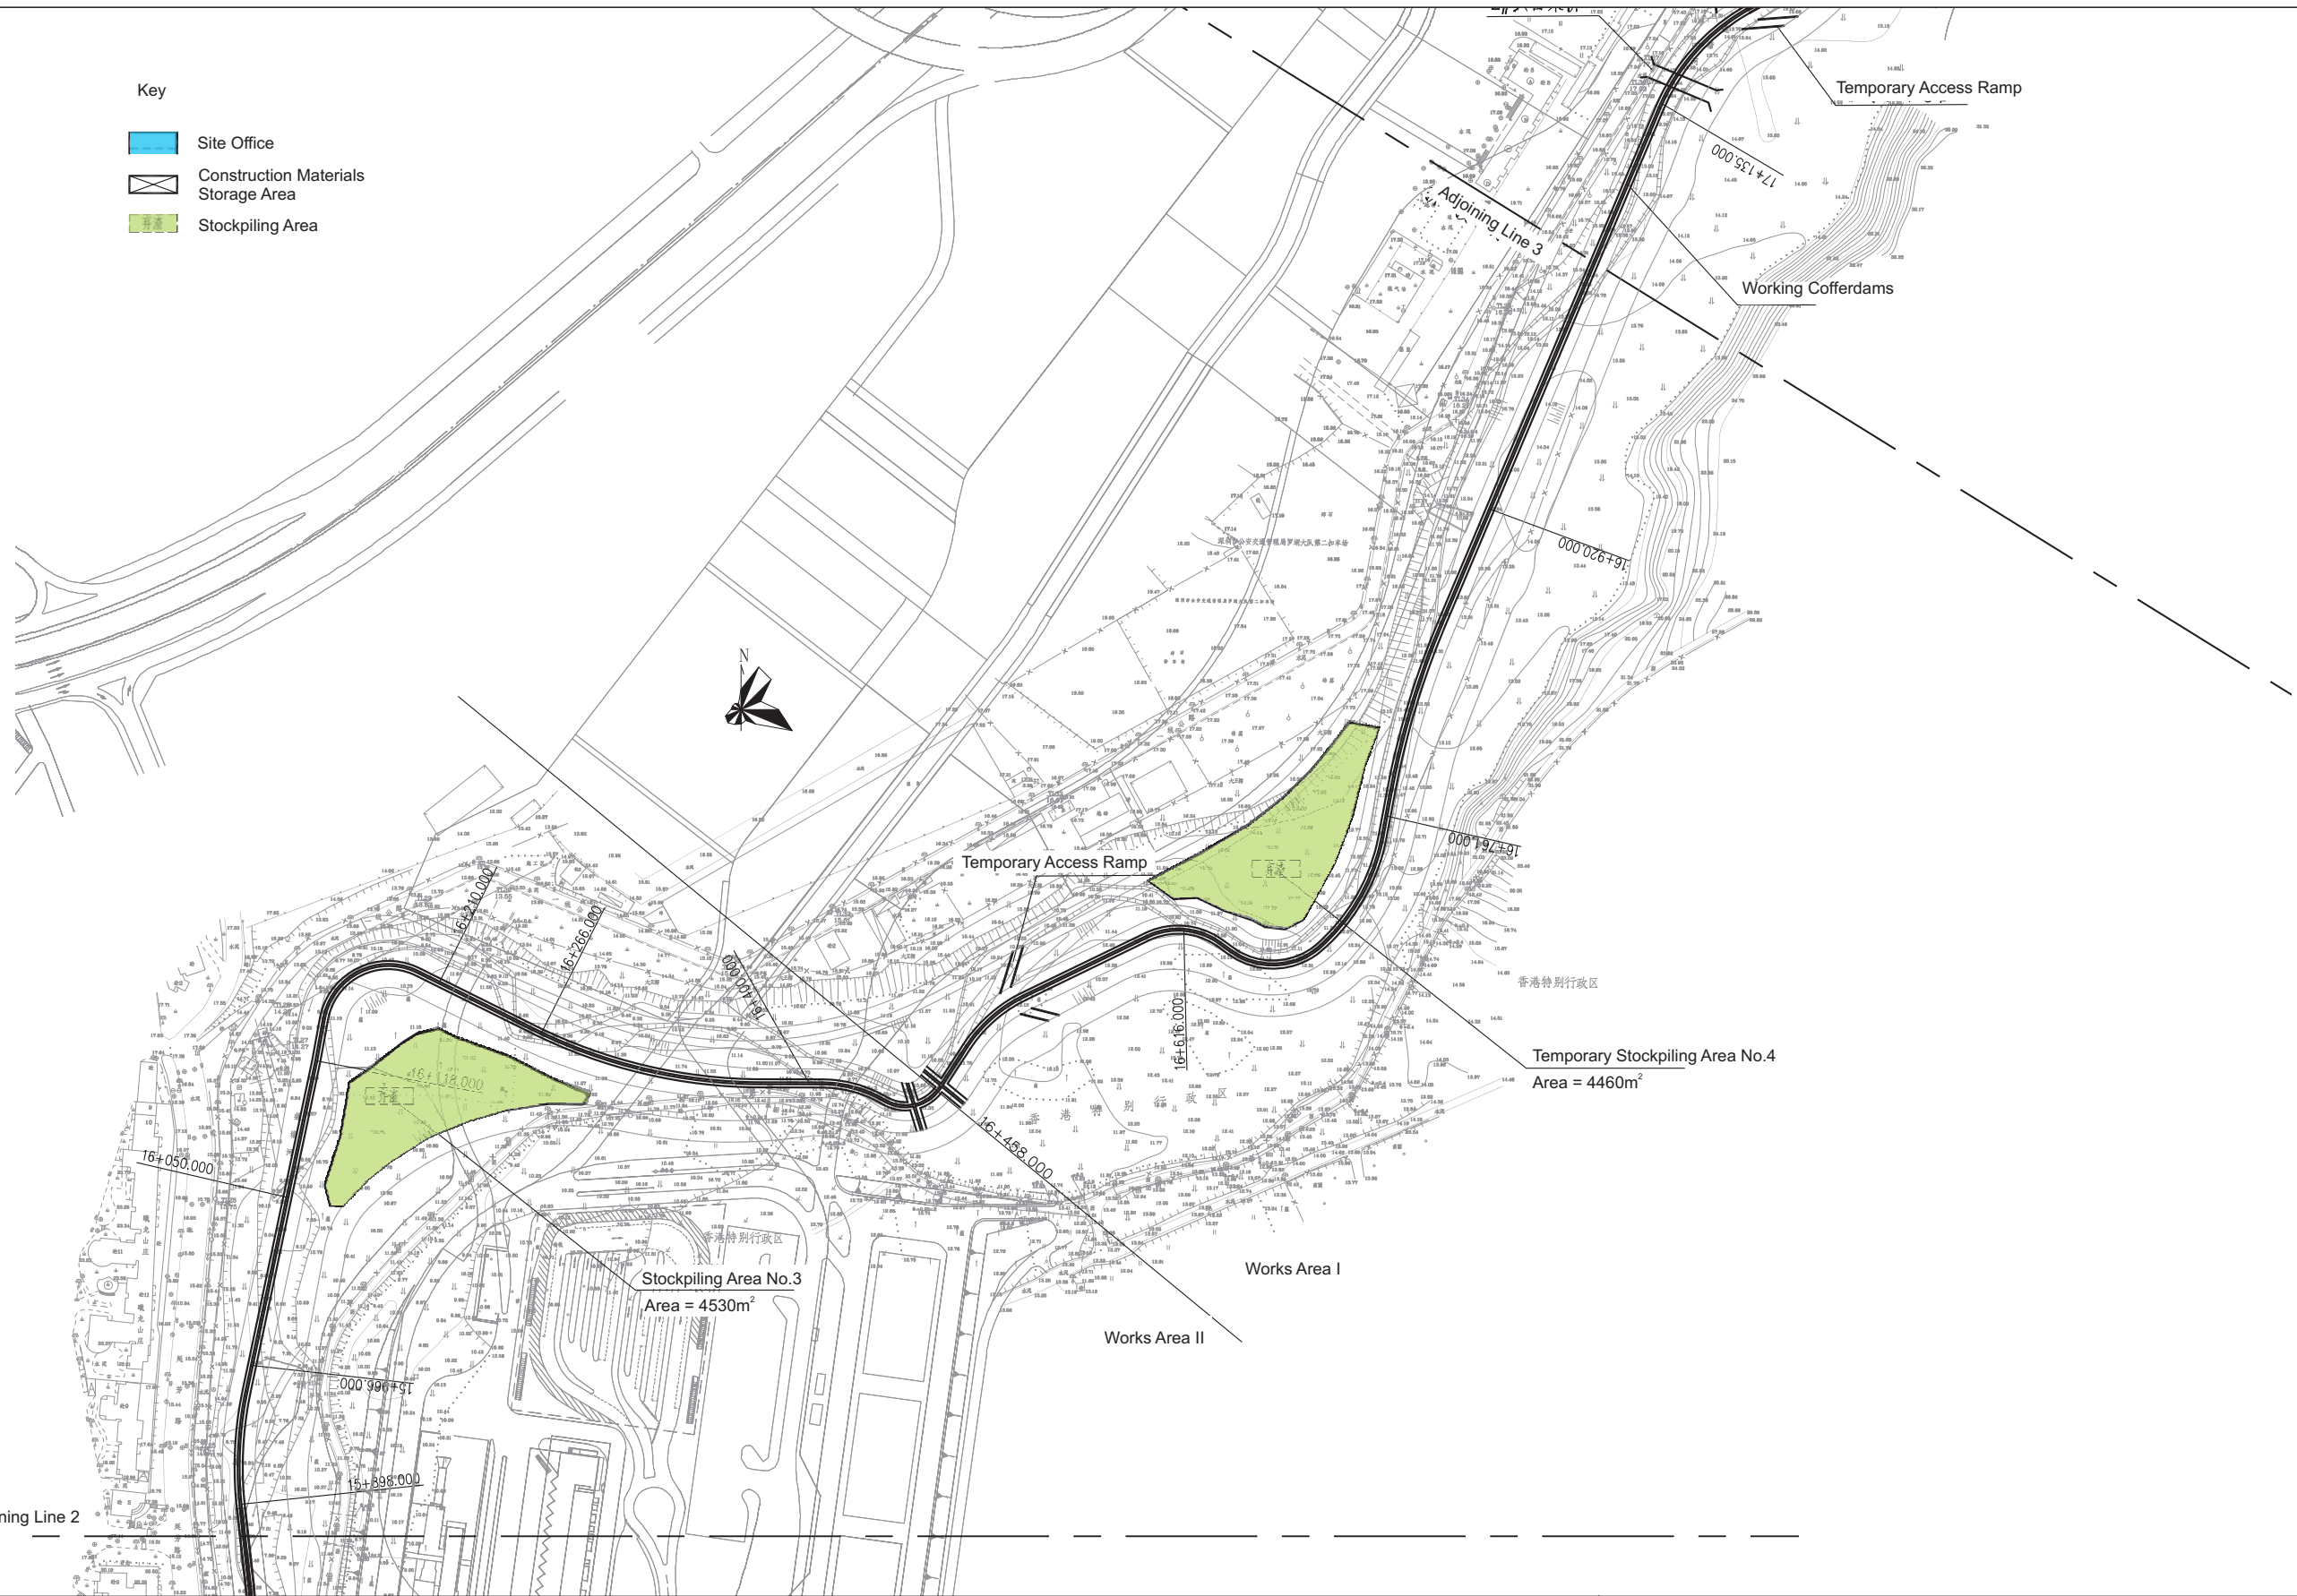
Locations of Stockpiling Areas (3/4) and Site Offices
